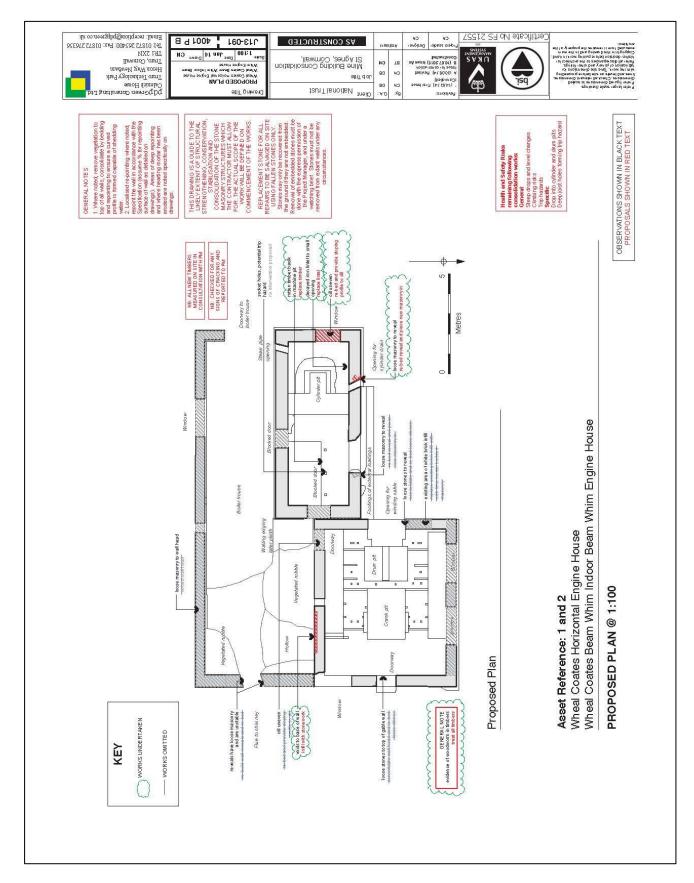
Plan of Wheal Coates horizontal engine house, beam whim and boiler house.
